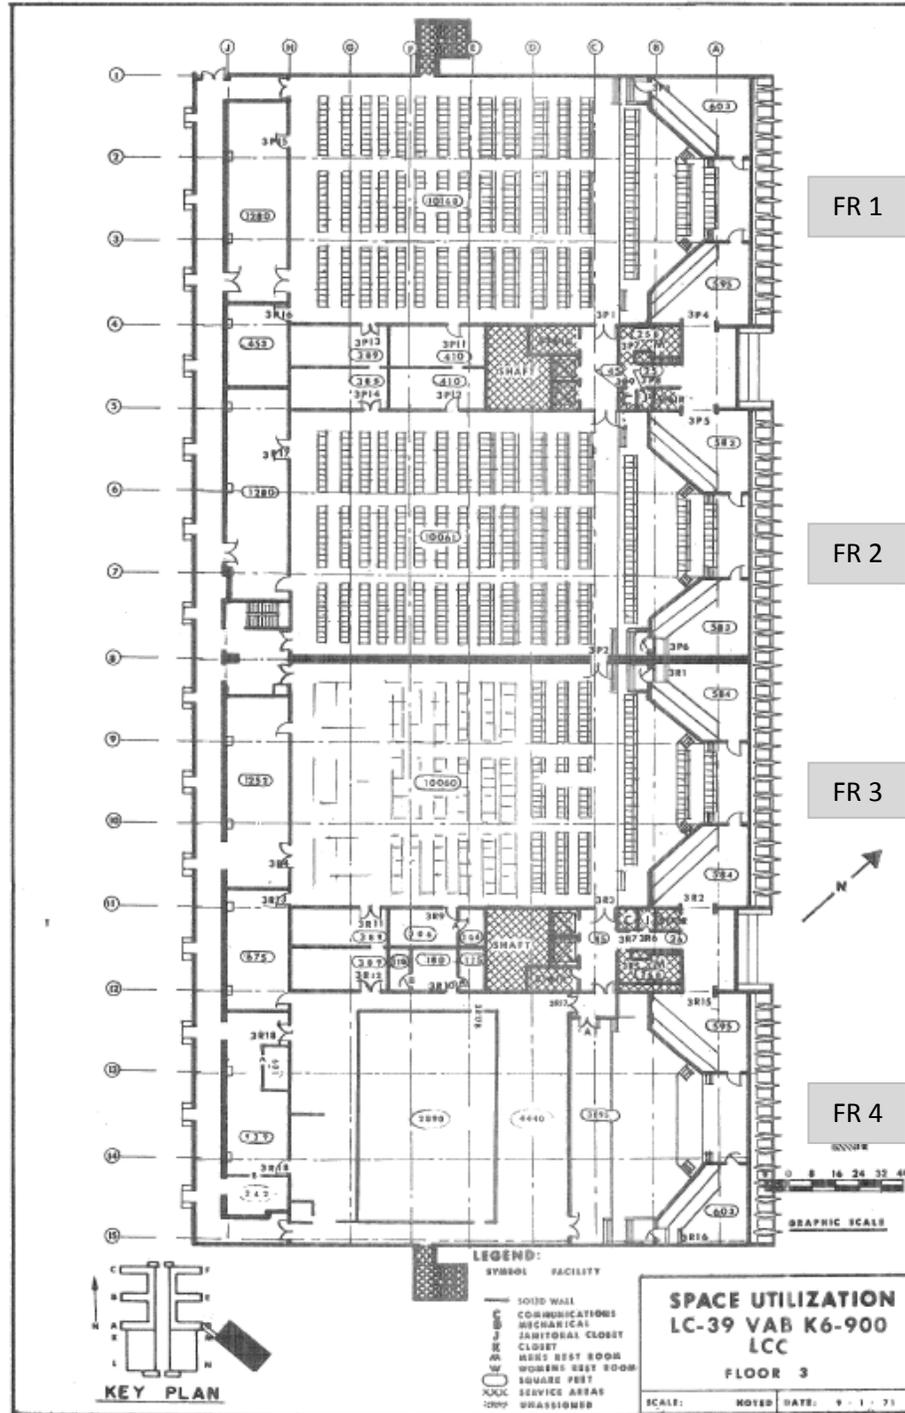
Apollo-era Firing Room Layouts, dated September 1, 1971.
